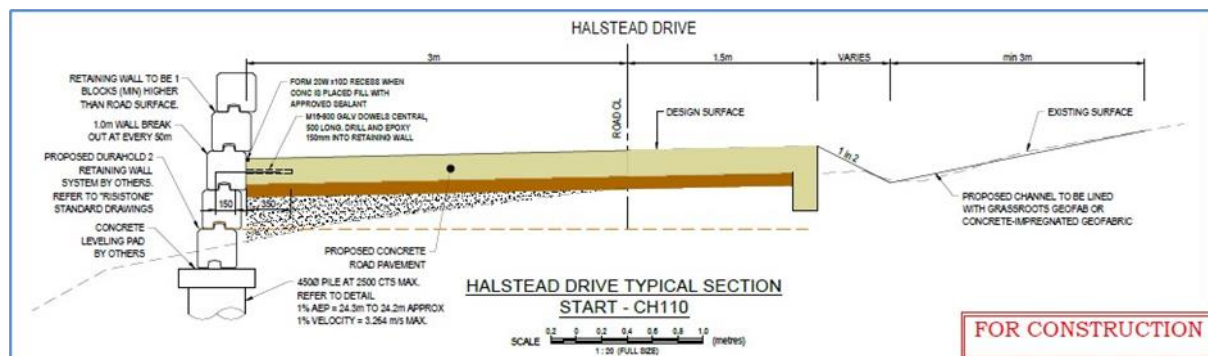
Typical Section of the original “DuraHold” Block Wall solution
